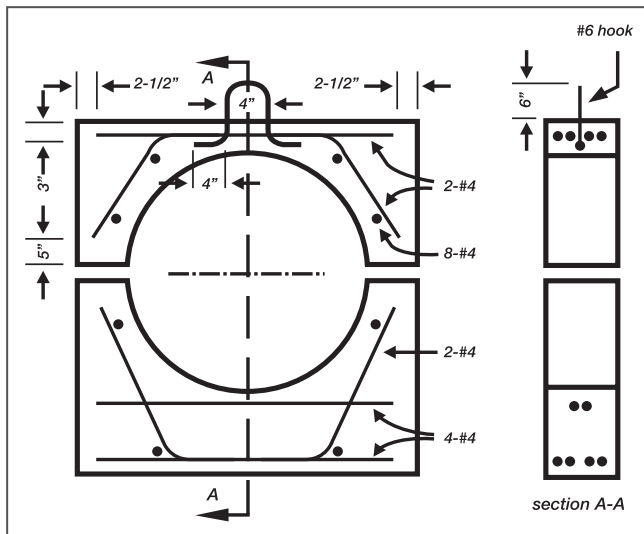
Typical Rebar Detail in Concrete Ballast Design
